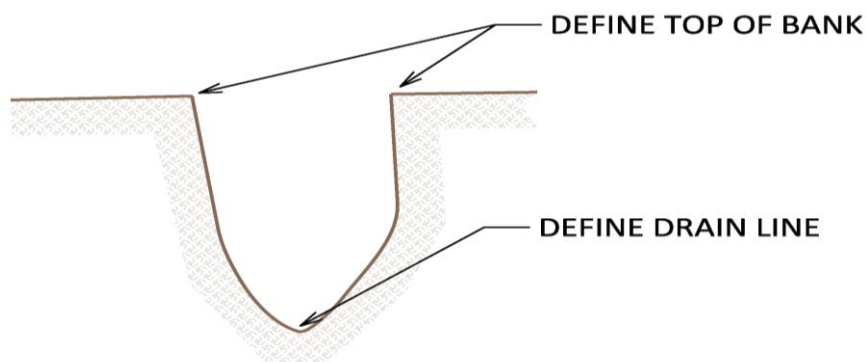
OUTFALL DRAINAGE SURVEY DETAIL – CROSS SECTION
